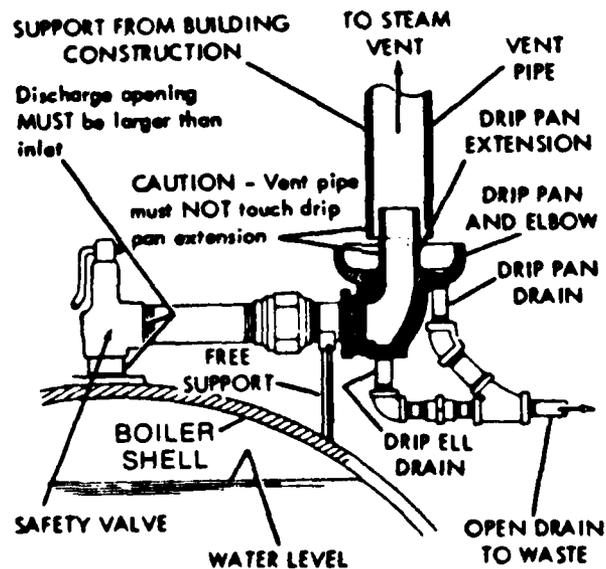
Drawing of Recommended Safety Valve Installation Procedure.
